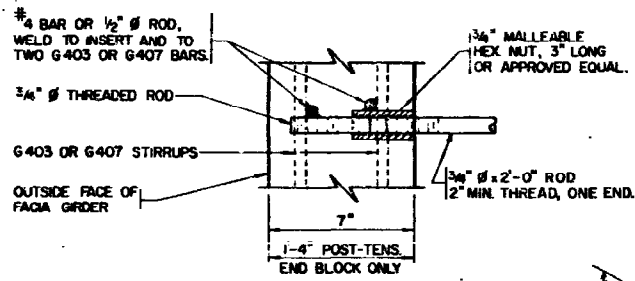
DETAILS AND DIMENSIONS NOT SHOWN ARE THE SAME AS FOR PRE-TENSIONED GIRDERS.
